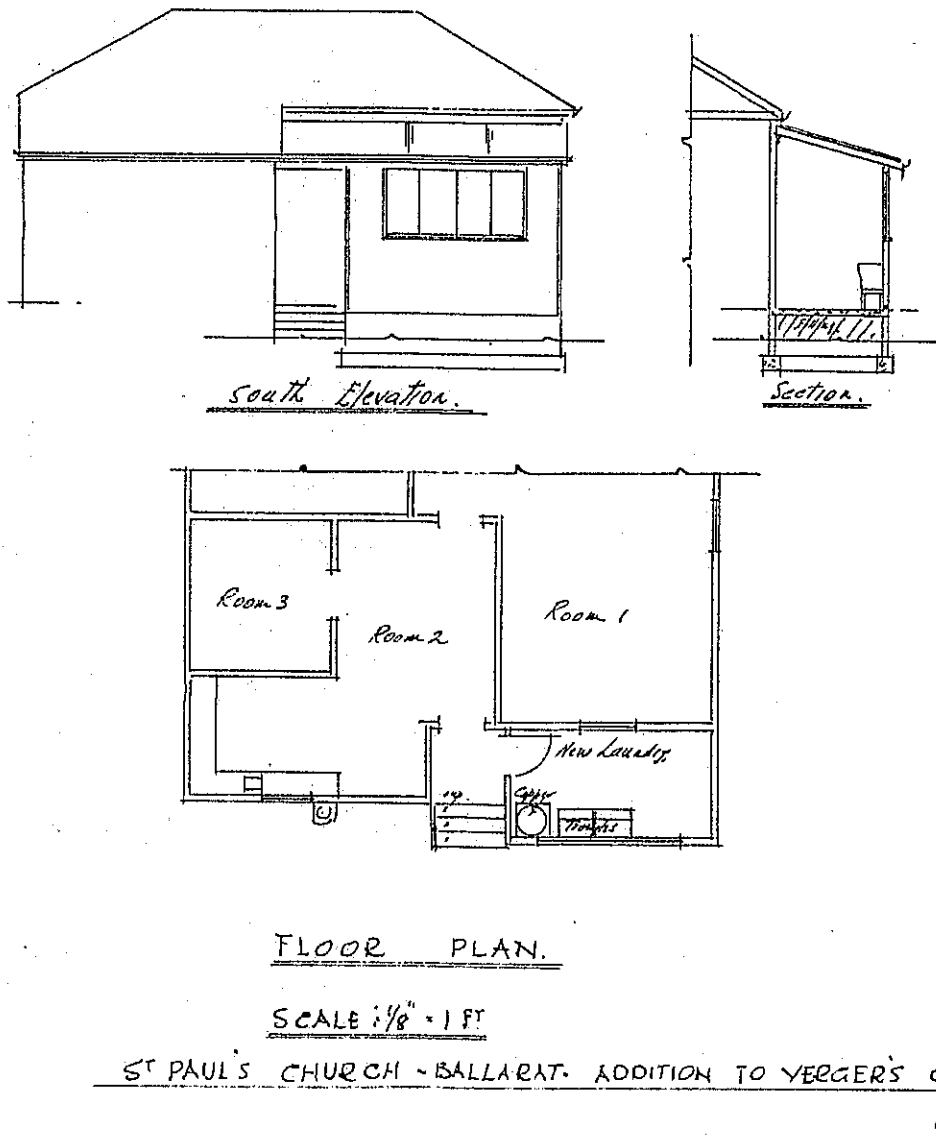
Drawing of Verger's Cottage showing proposed laundry addition, August 1963. Source: St. Paul's Anglican Church.
